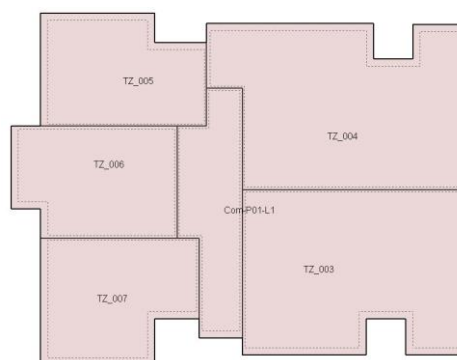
Thermal zone definition on ground floor (4E L5 building of the Stepa Stepanovic neighborhood)
